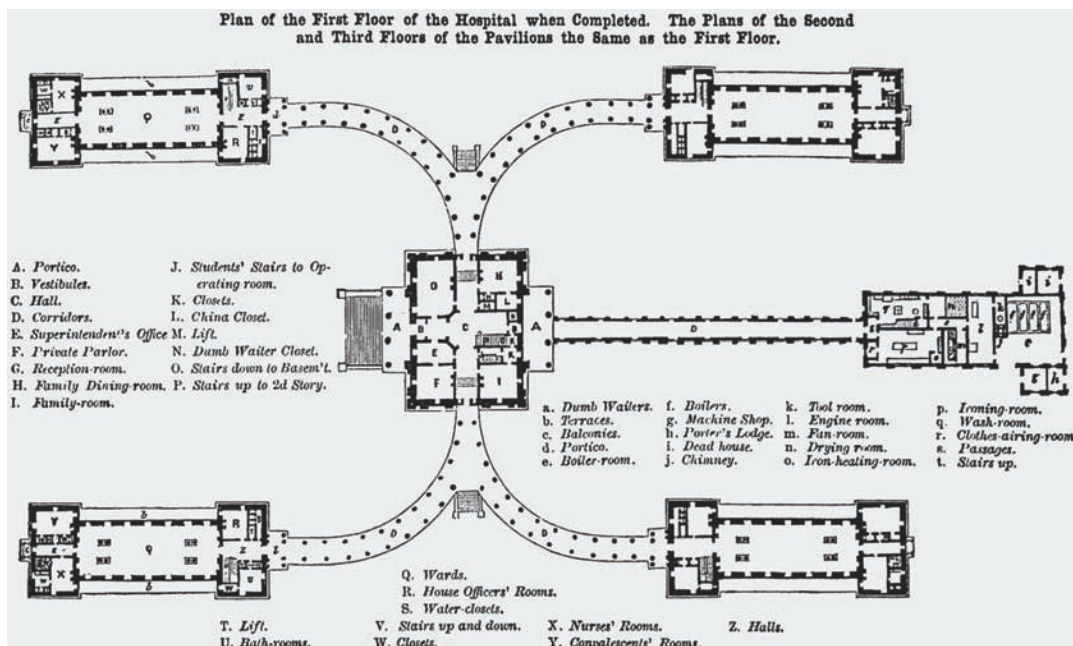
City Hospital, Boston, plan, 1865. Gridley Bryant's design was a pavilion plan with widely separated wards connected only by open arcaded walks. The boxes drawn in the ward plans represent risers for heated air. The hospital plan was published and proved influential on a number of other early American hospital designs.
